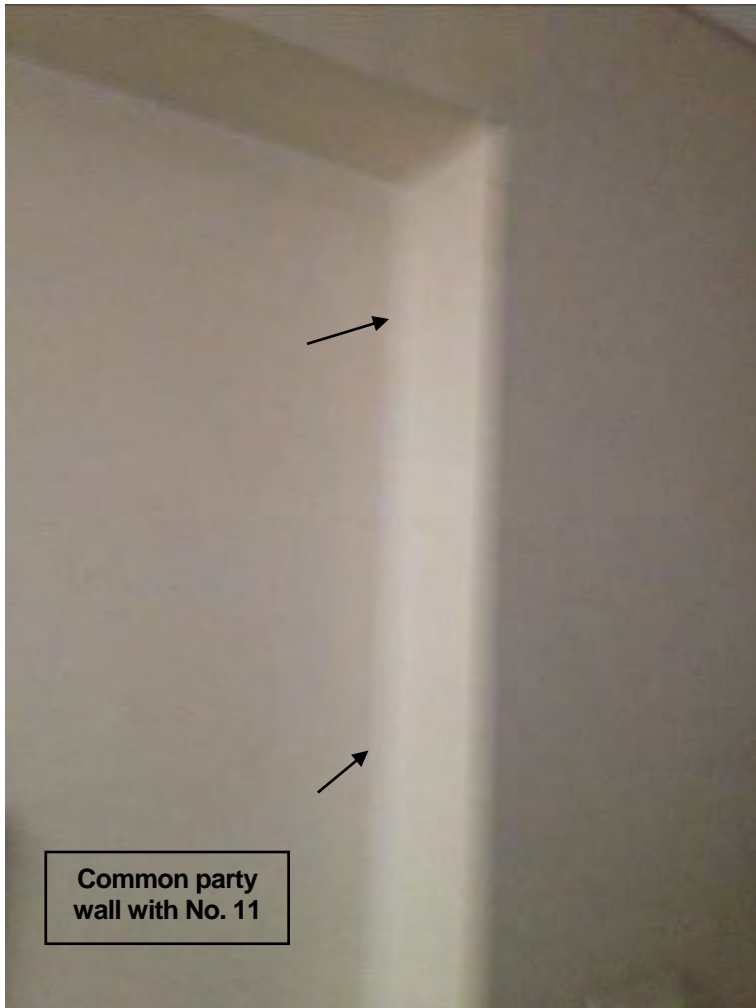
shows a hairline radial crack to the *common party / separation* wall at the first landing to the stairs
